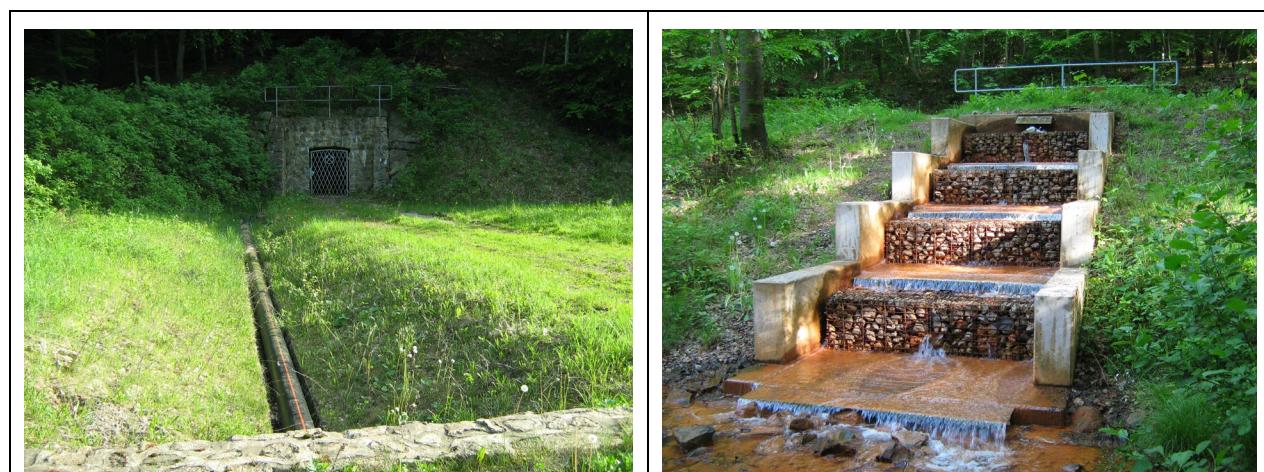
Current situation at the fluorspar mine site: adit with mine water outlet (left); aeration zone for mine water passive treatment of the drainage water (right)
